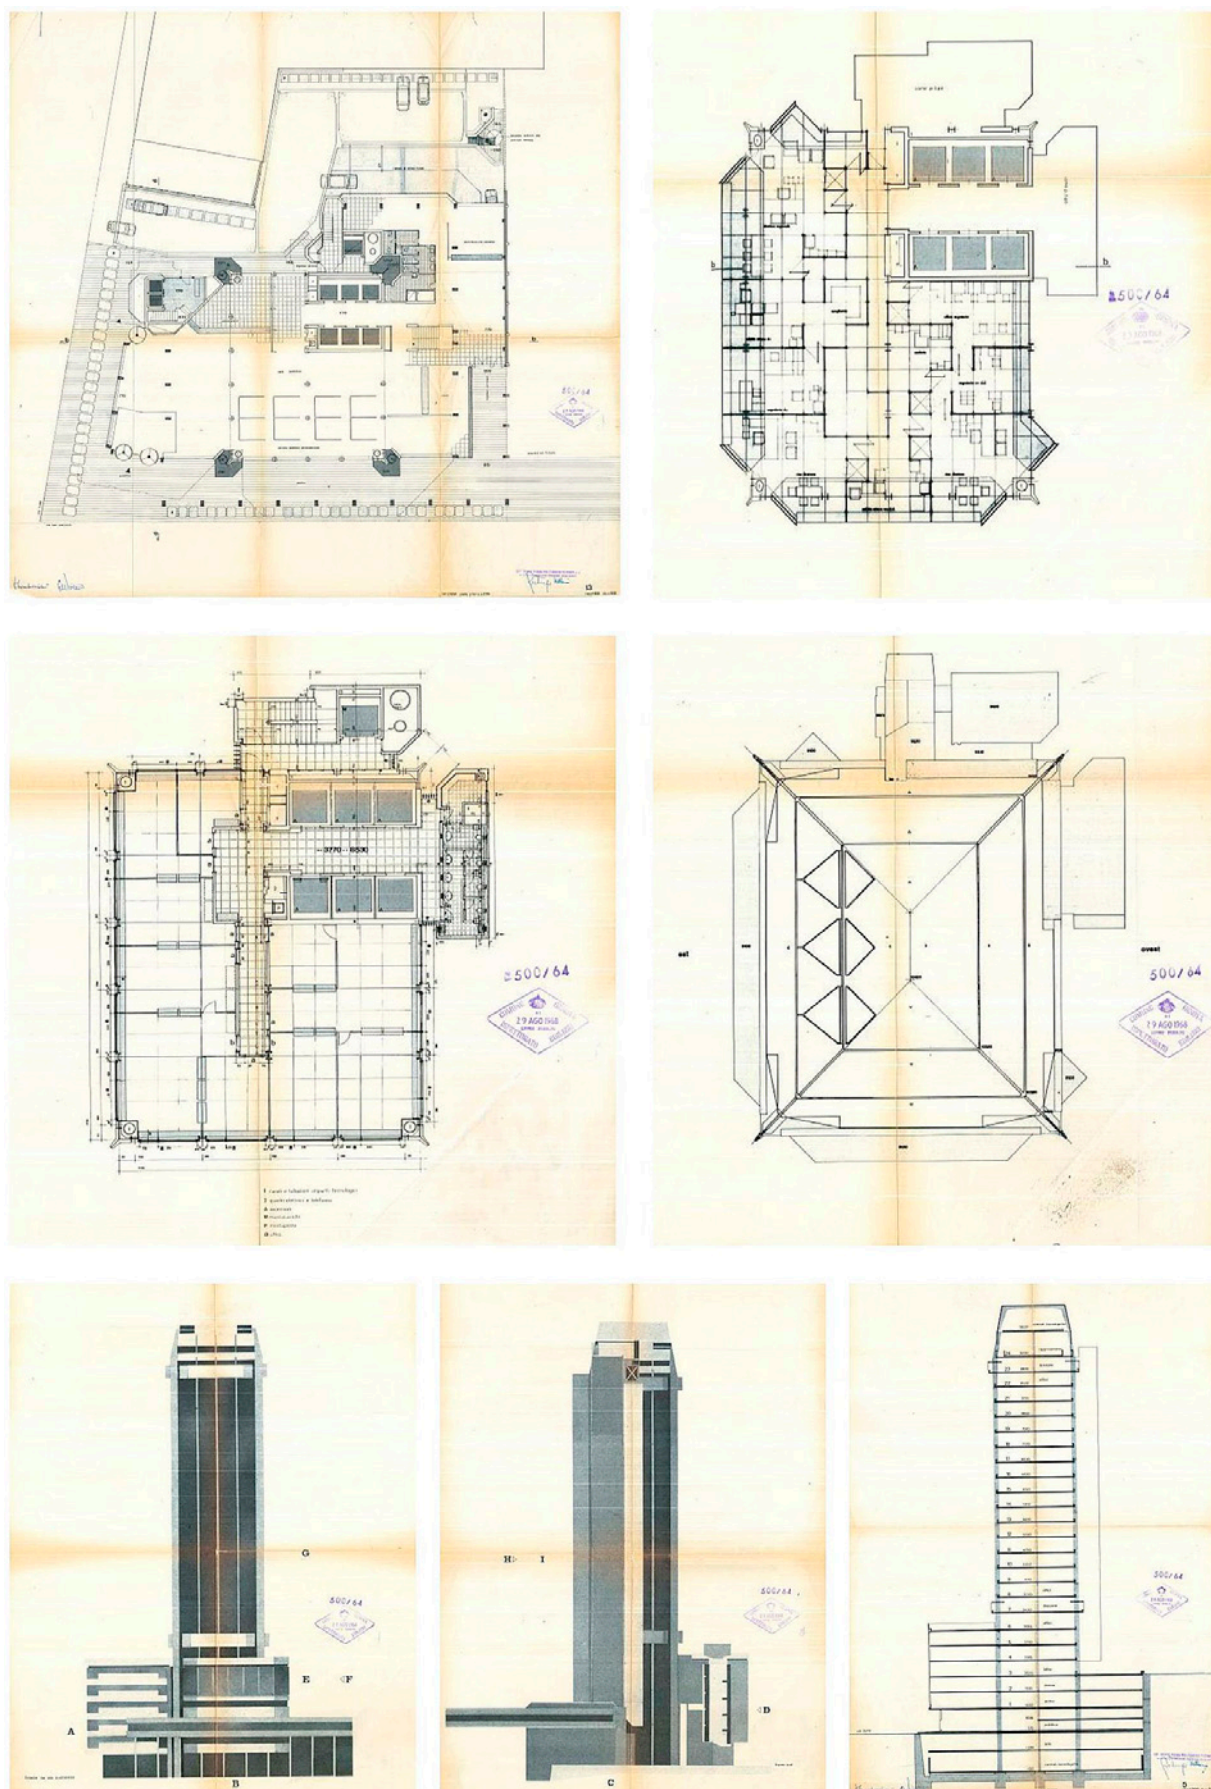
Project drawings. Top: ground floor plan and seventh-floor plan. Middle: type floor plan and roof plan. Bottom: elevation on via San Vincenzo, south elevation and section. Source: © Archivio Edilizia Privata, Comune di Genova.
